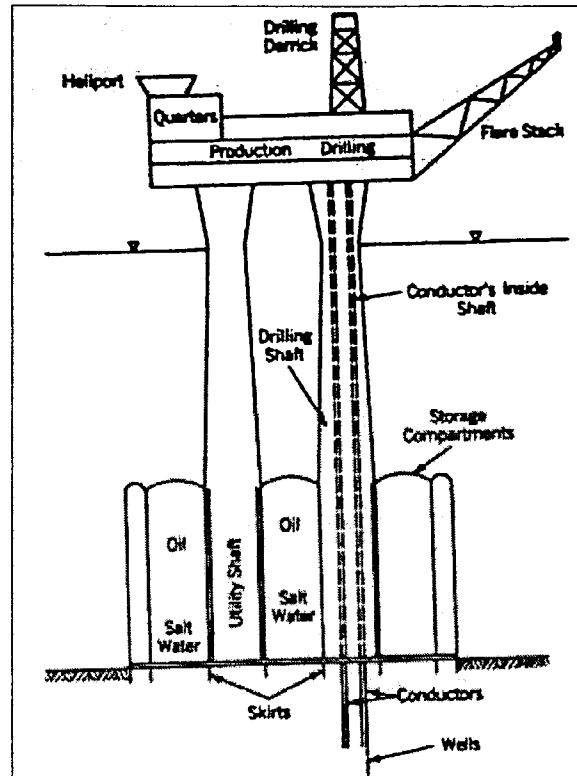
Concrete Gravity Platform – Condee type (B.C. Gerwick, 1988)
